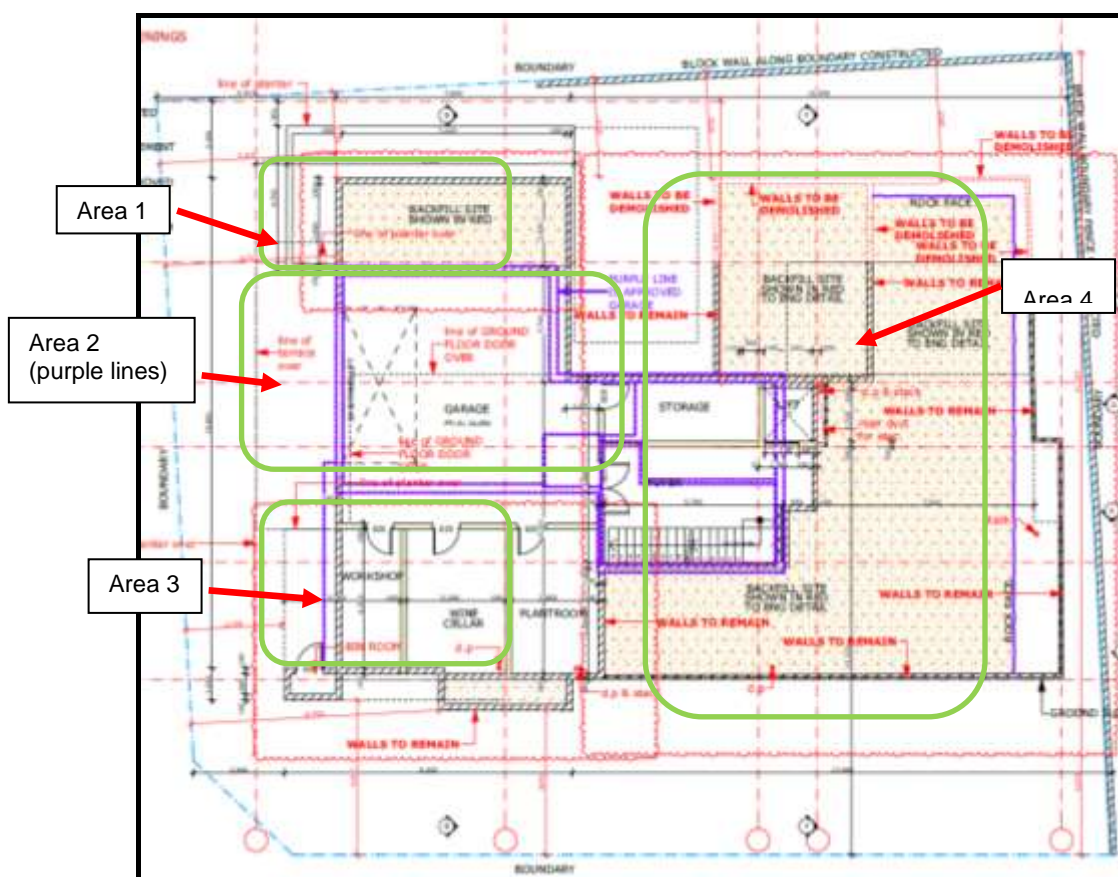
Proposed Basement Plan outlining walls to be demolished and walls to remain (Source: Issue L - David DeChiara, 24/5/2022)
